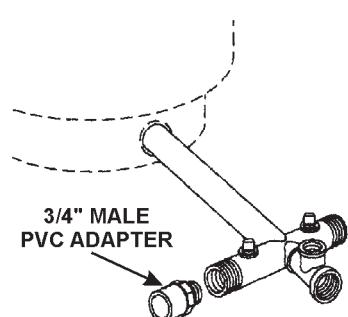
3/4" Adaptor Threaded in Tank Tee
